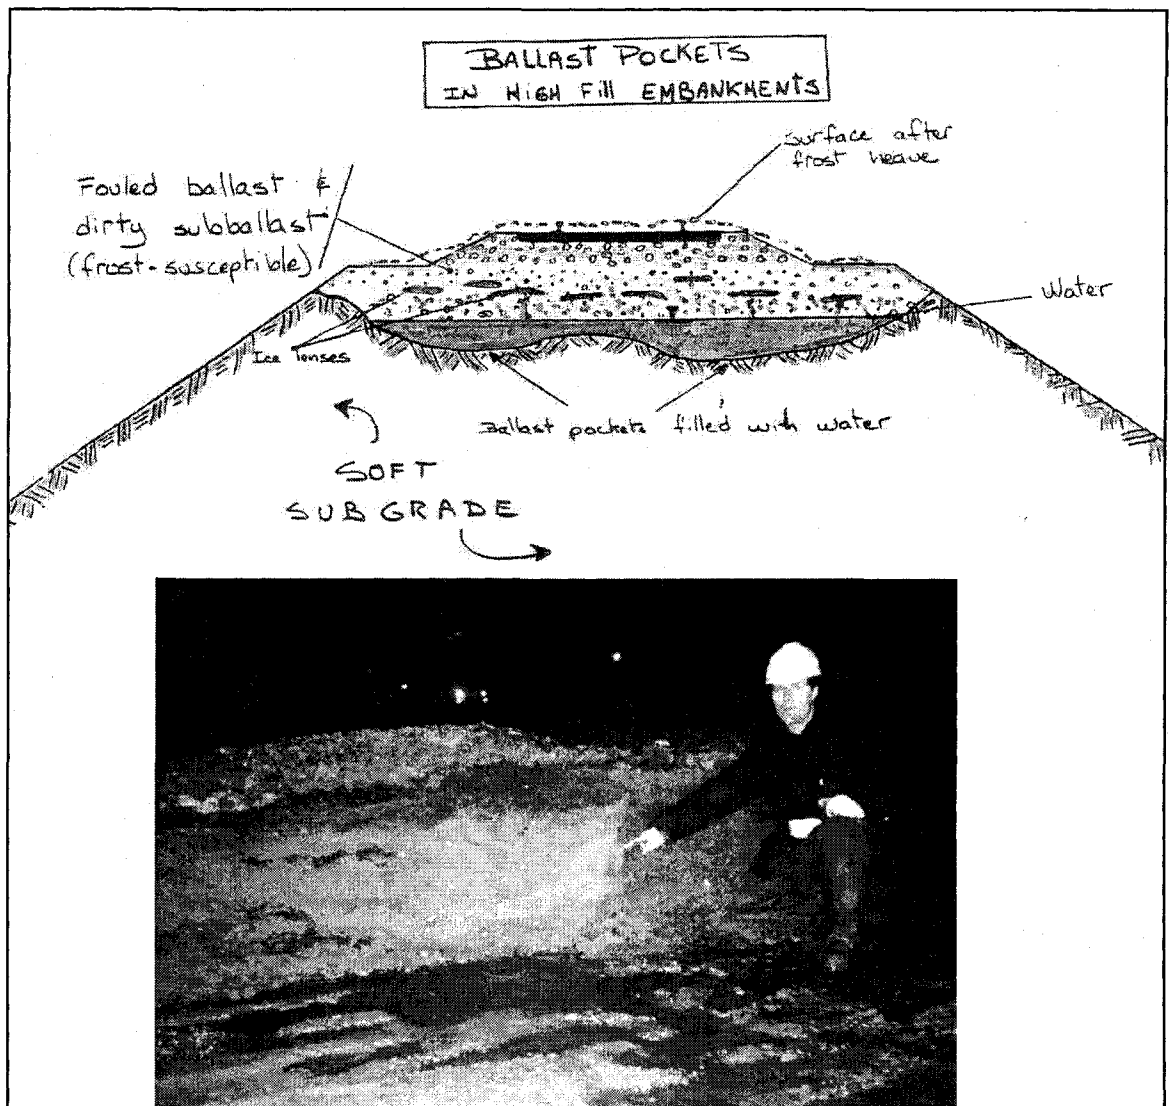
Sketch section and photo of an SPD that resulted in a ballast trough (Sketch and photo courtesy of Mario Ruel, CN Senior Geotechnical Engineer, Montreal)
